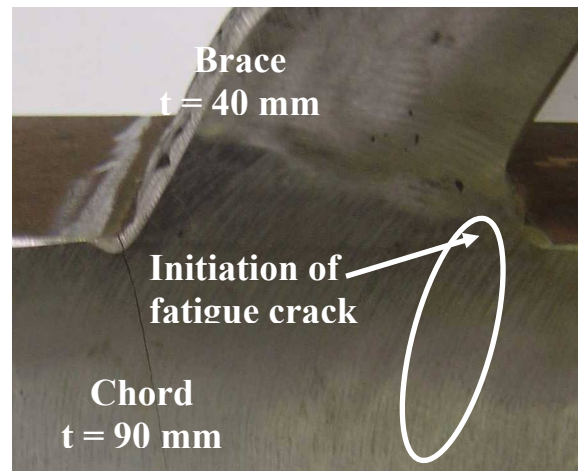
Test Specimen Y\_2 with Fatigue Crack at the Weld Toe
